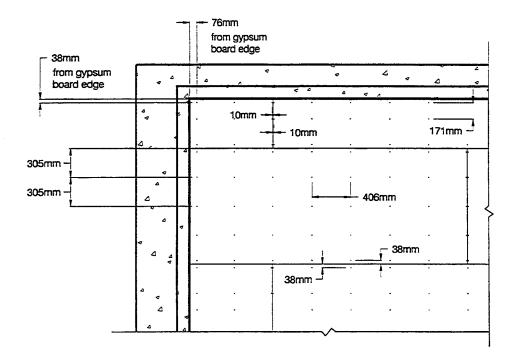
Screw pattern for single layer gypsum board layout, resilient metal channels 406 mm o.c.
